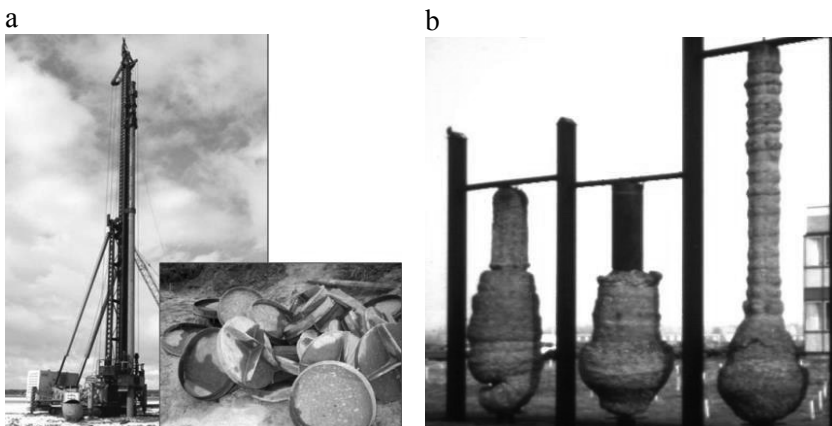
a – execution of the Vibro pile and steel base (photo by K. Gwizdała); b – Franki piles (photo by K. Gwizdała)
